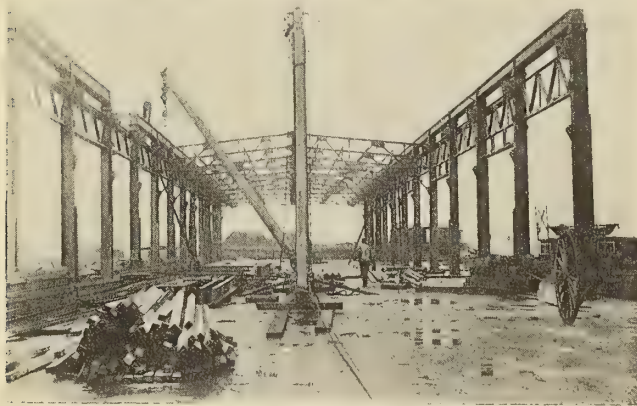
Details of Construction of Terminal Shed, Indicating One Method of Attaching Crane Rails, Steel Framing and Roof Trusses
